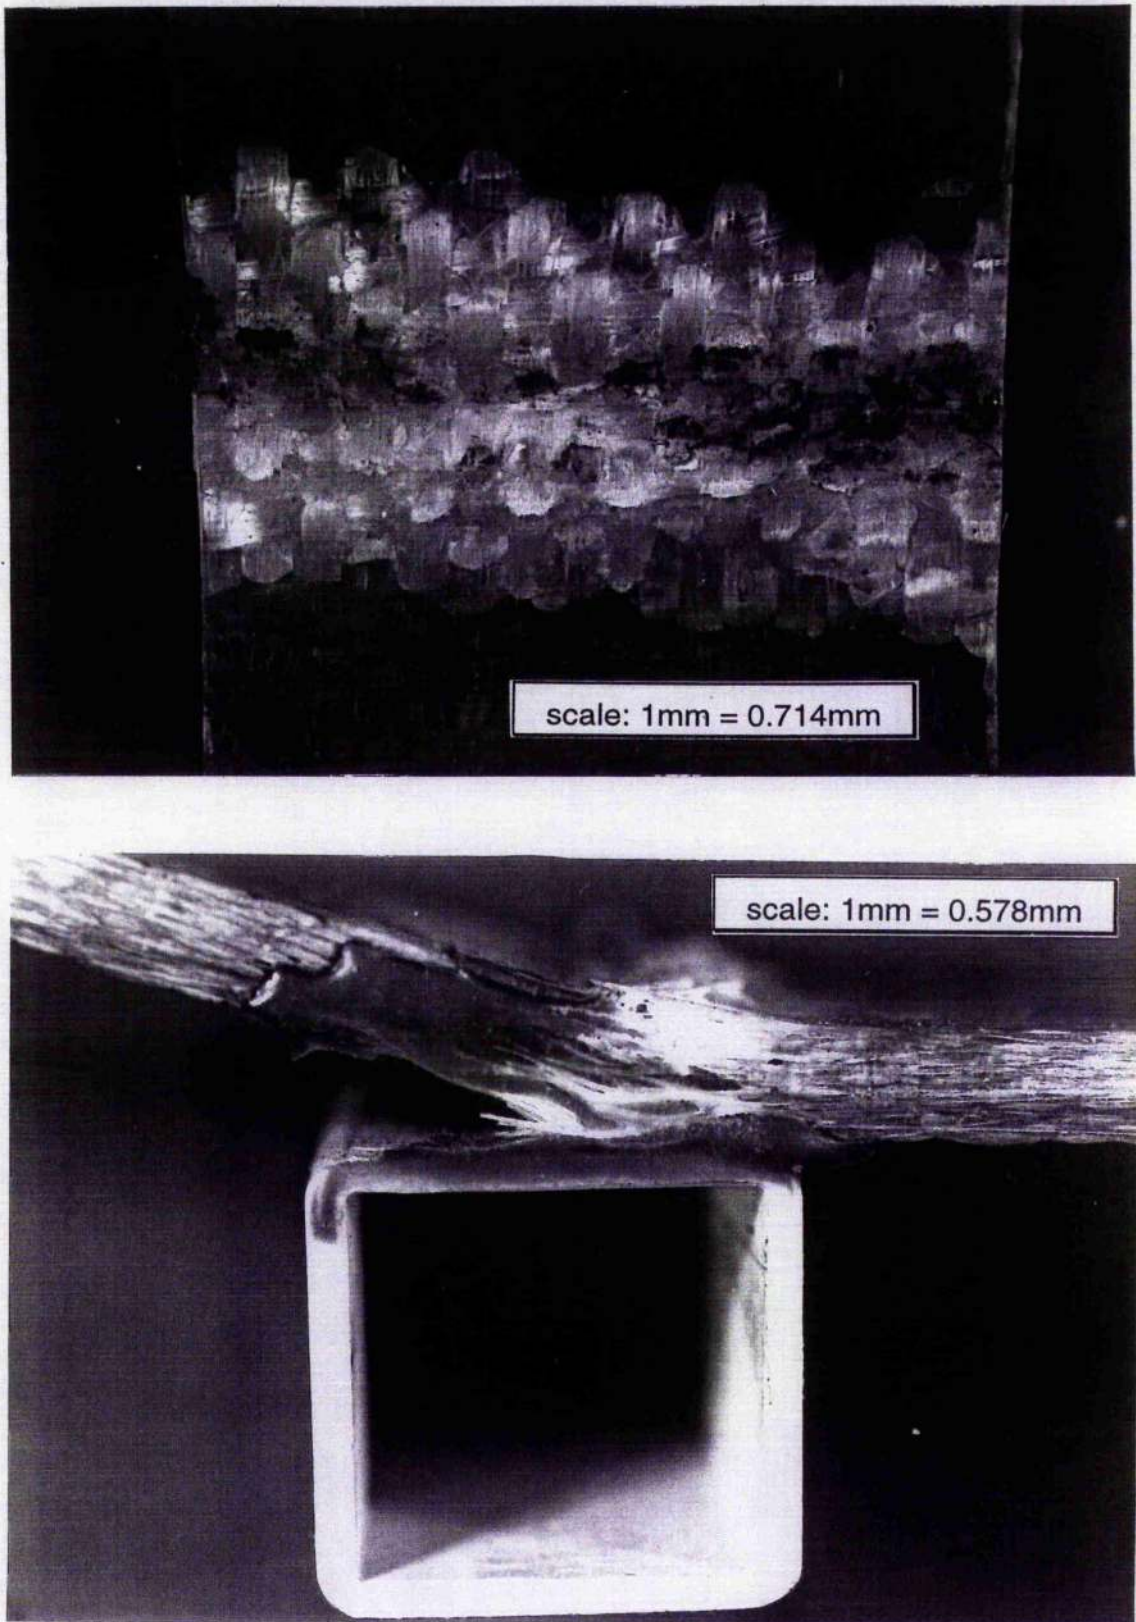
Fatigue failure surfaces of the unstressed attachment
